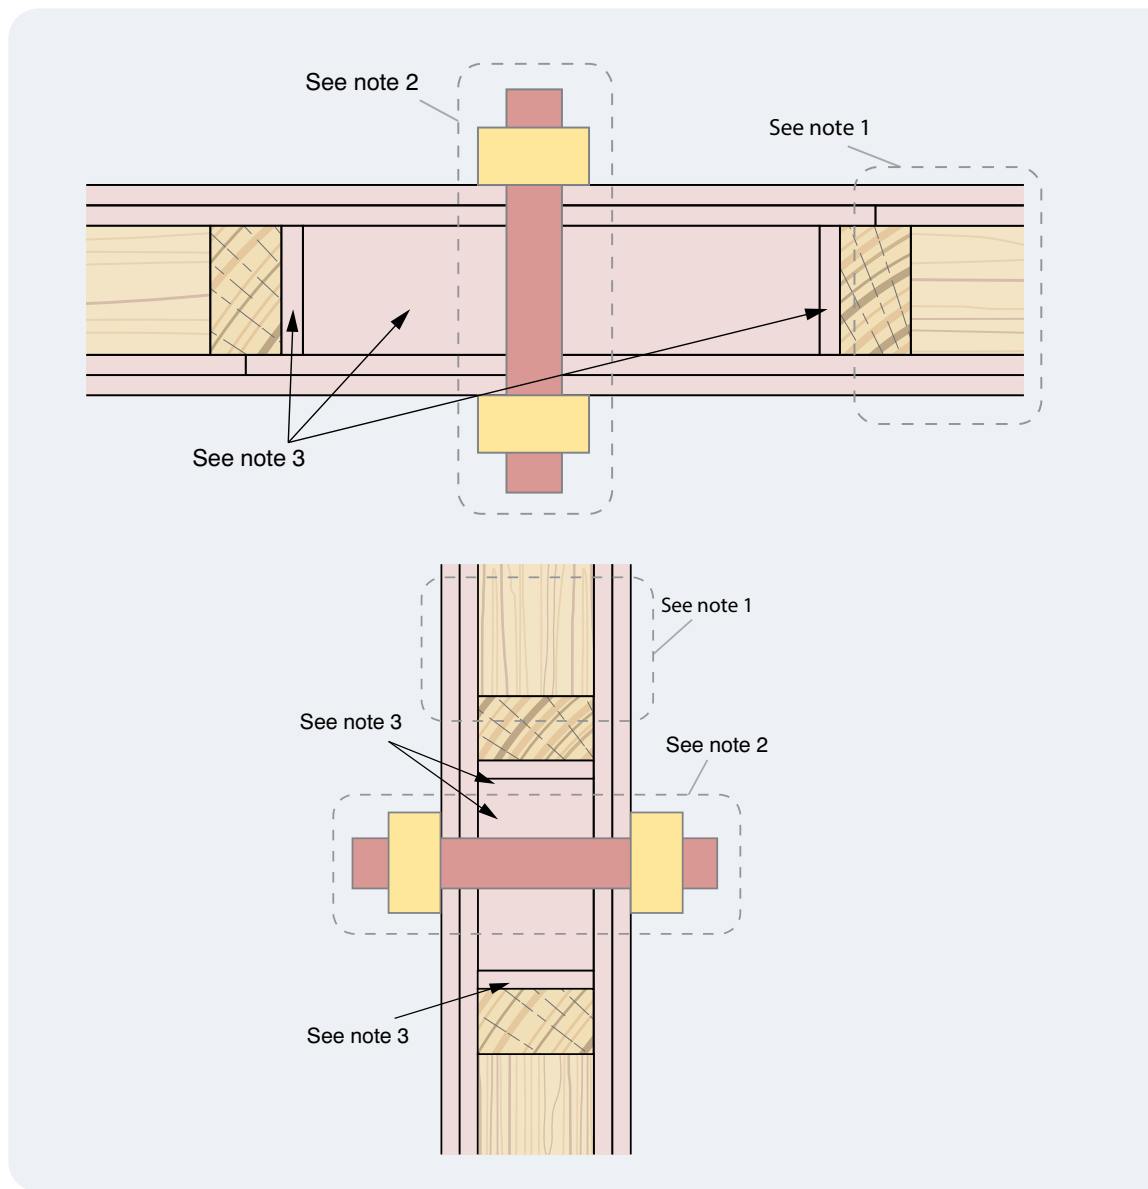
Plastic pipe penetration through fire-protected timber-framed walls with internal linings.
